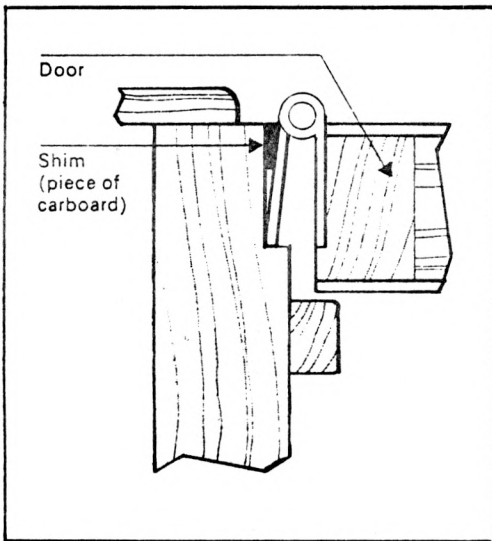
INSERT STRIP OF CARDBOARD UNDER THE LEAF NEXT TO THE PIN
